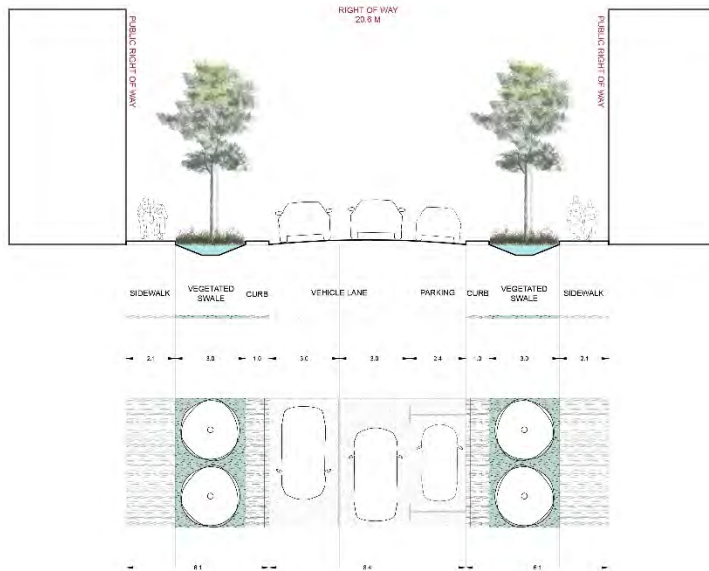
Optimized Local Employment Complete Street Cross-Section
